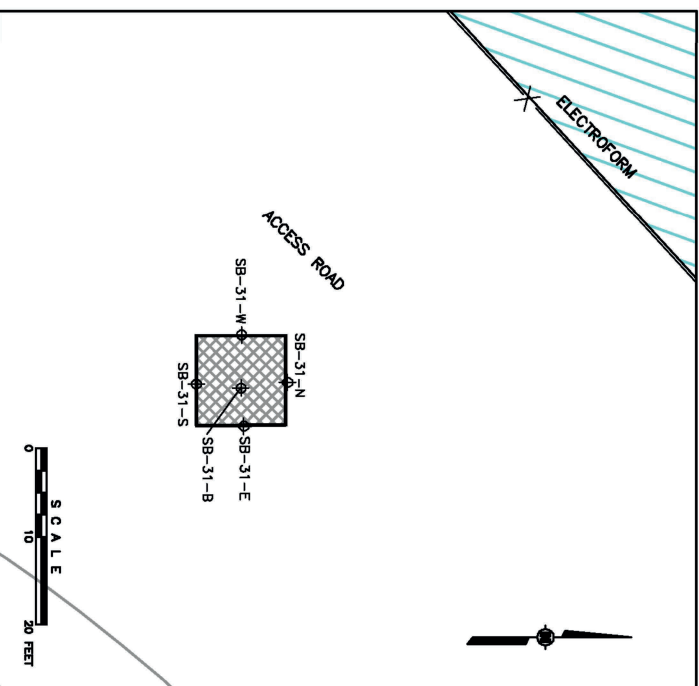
DETAIL B: WEST OF FORMER OUTDOOR PROPANE STORAGE TANKS EXCAVATION (CSB-18)
